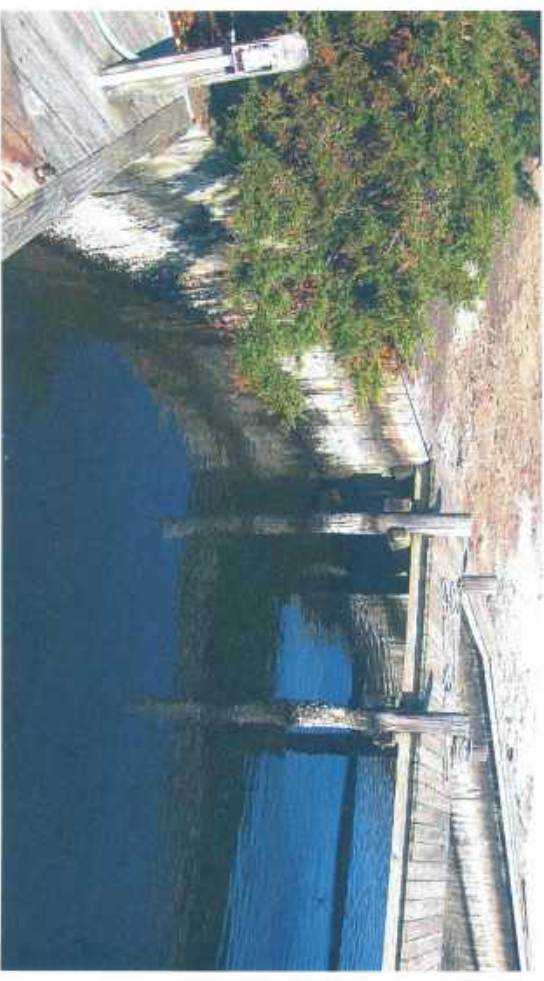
LOOKING AT NORTH SIDE OF BOAT SLIP
